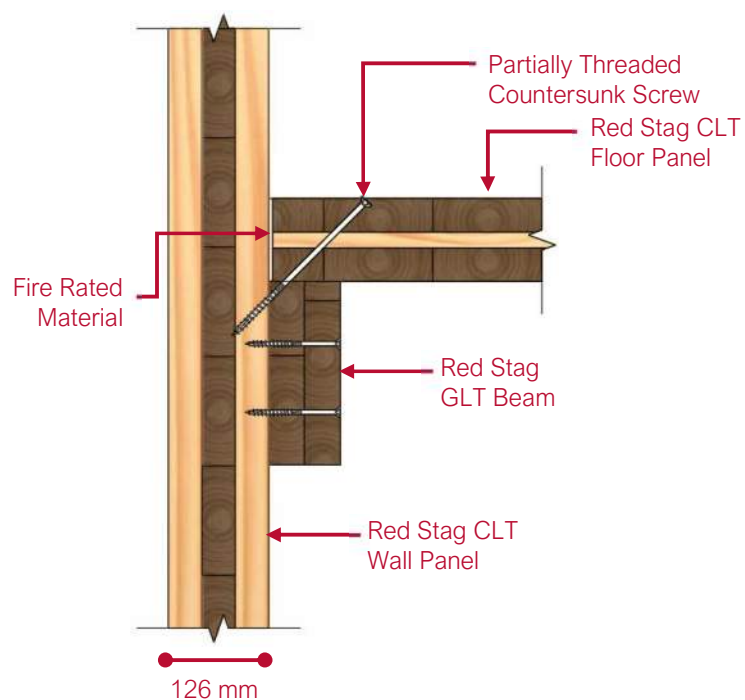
Red Stag CLT wall panel to CLT floor panel (On edge of external walls of building).
